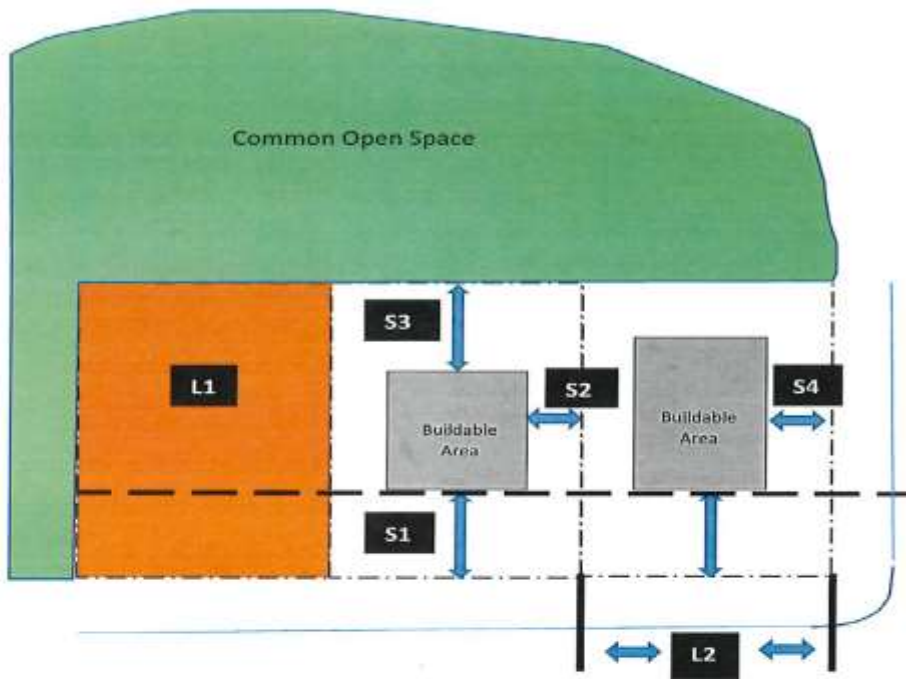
Residential Lot and Building Regulations (Conventional Development)
